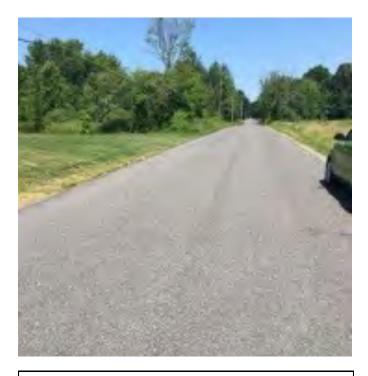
Facing north — view of CR 27 north of U.S. 20.
